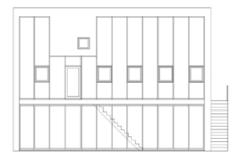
Y-House Elevation 2 D 1.615(Archi) and 1.505 (Benoit)
